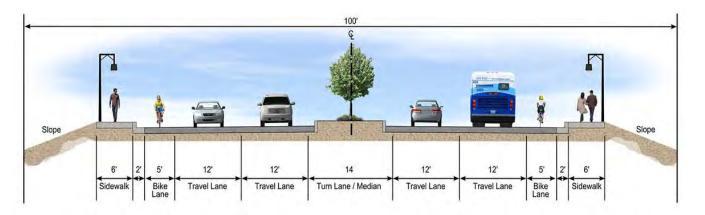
El Rancho Drive to 1st Avenue Cross Section (Where Slopes are Constrained)
